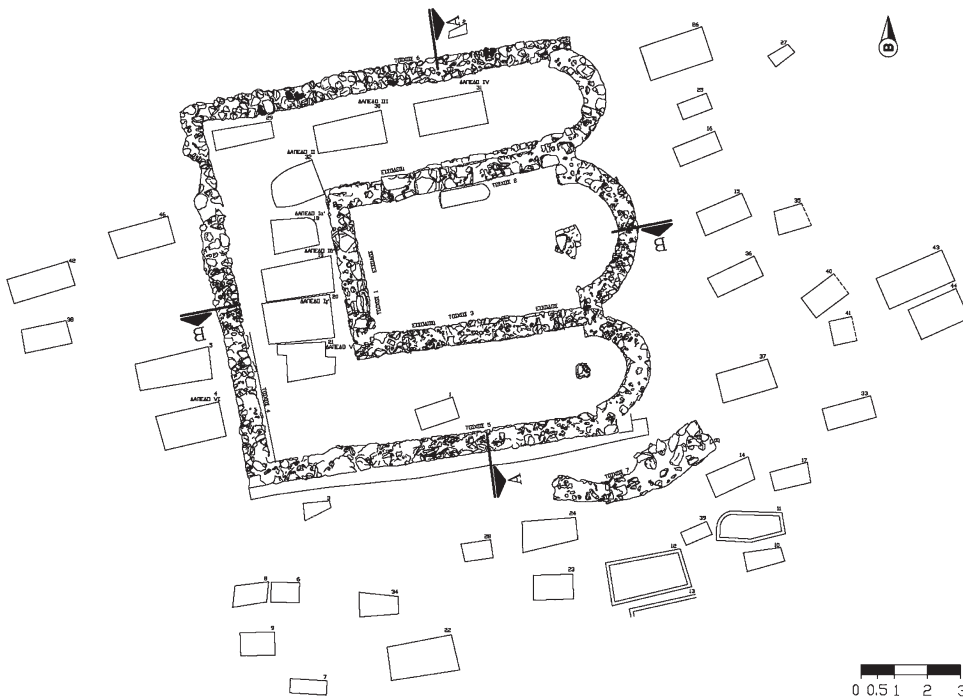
Plan of the church with excavated graves. – (Plan S. Sdrolia).
